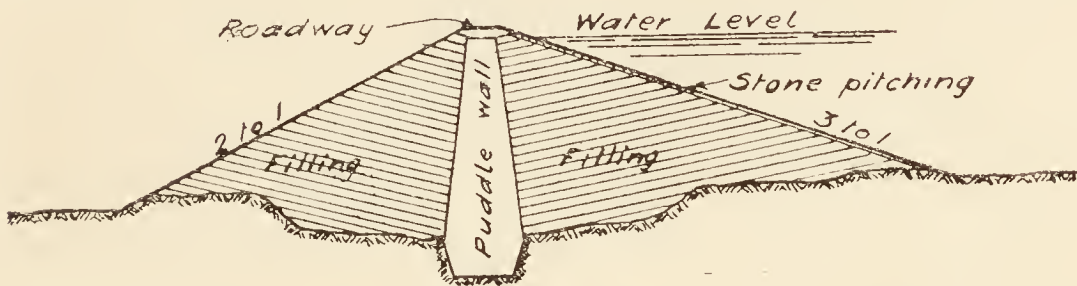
Section through earthen dam showing impermeable puddle wall.
